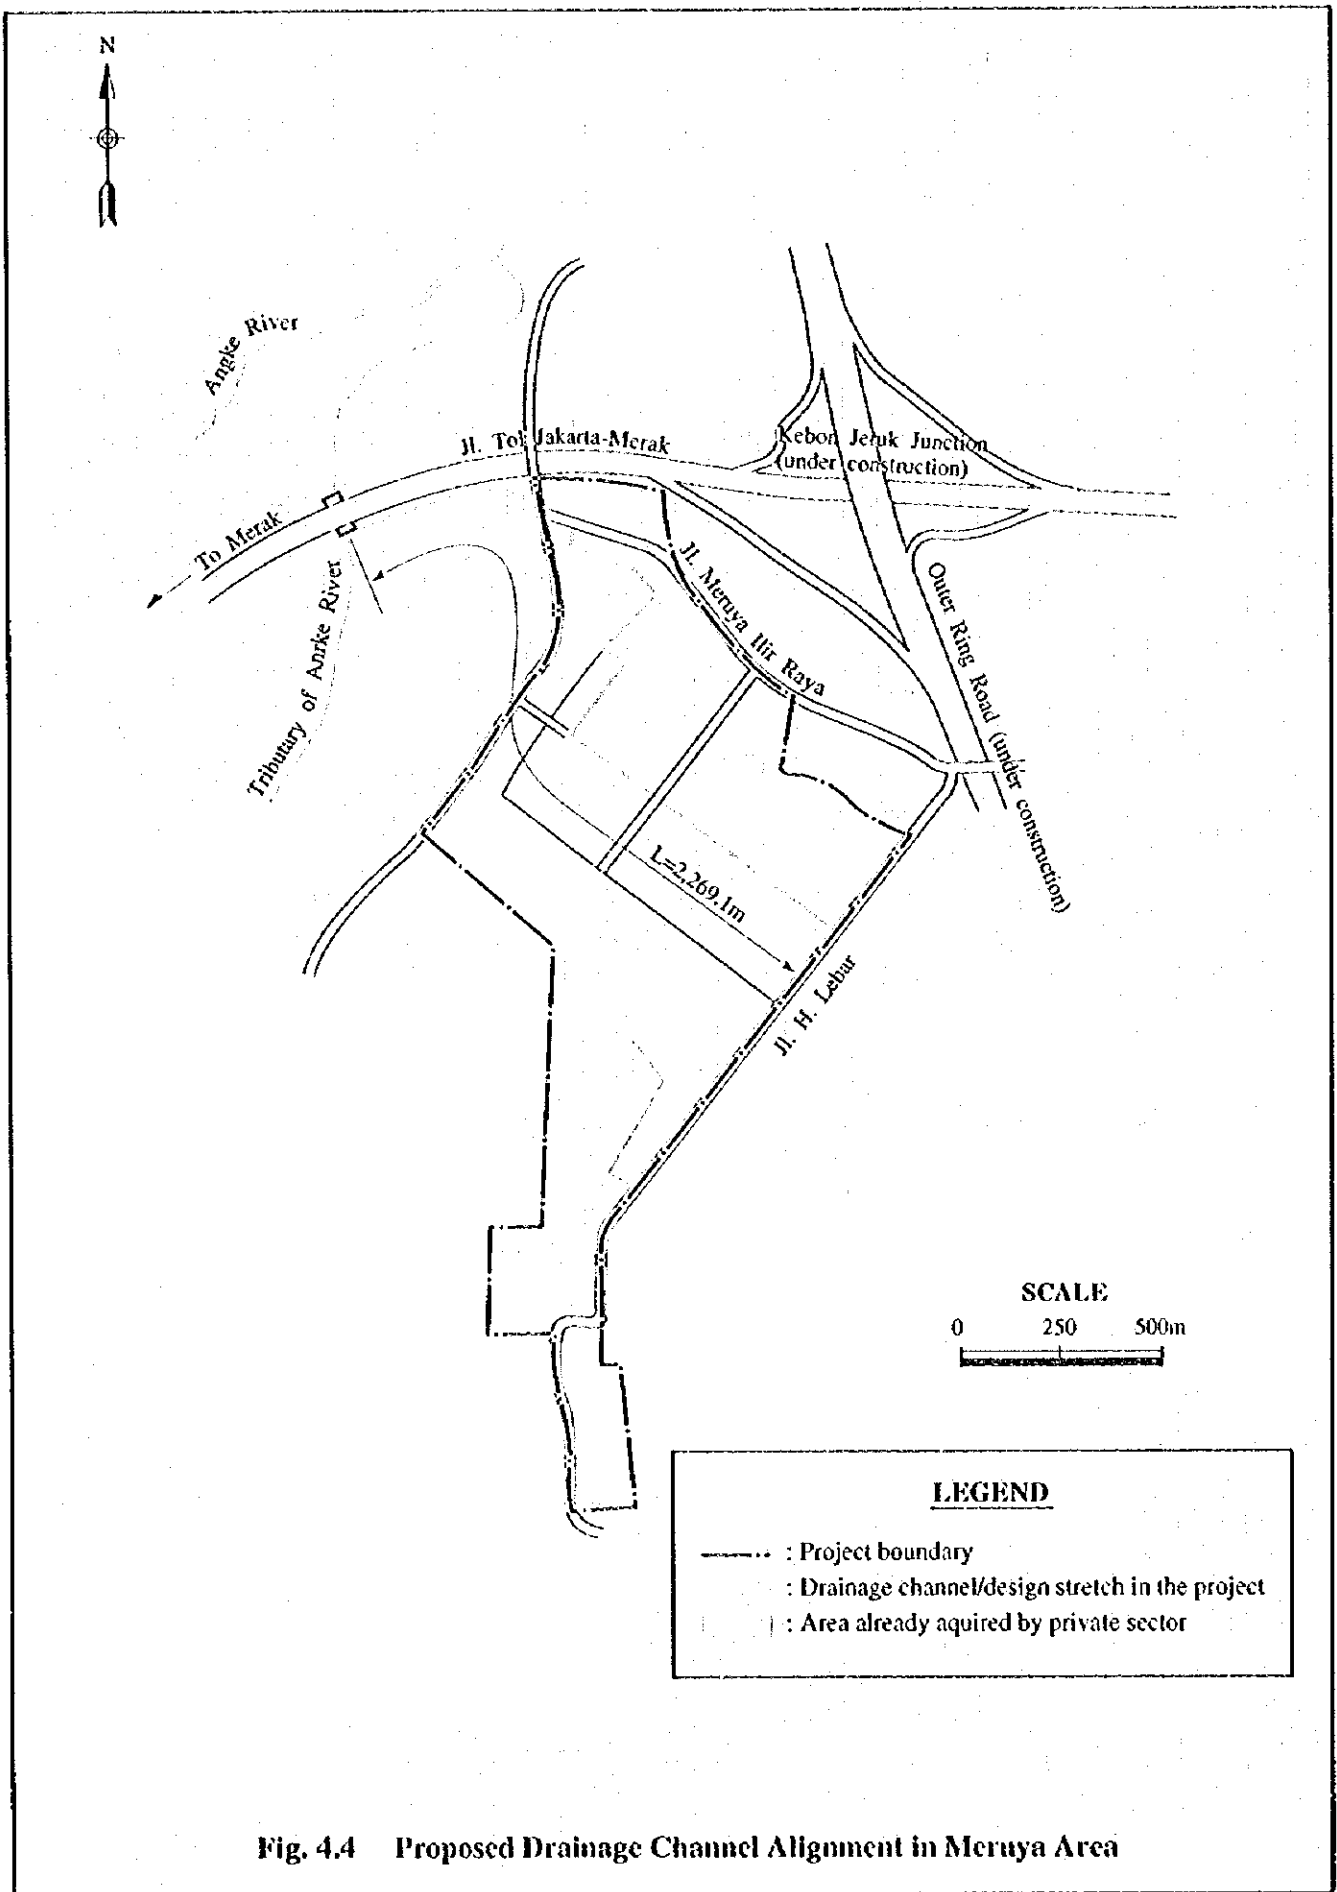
Proposed Drainage Channel Alignment in Meruya Area
